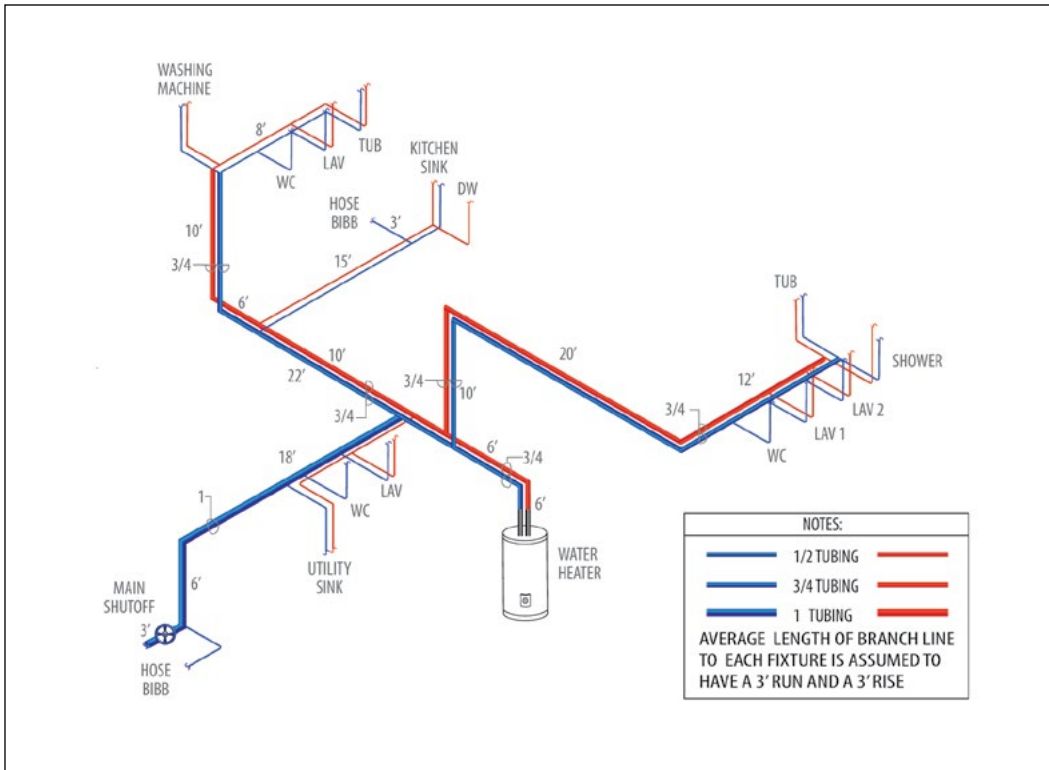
Trunk and Branch Isometric Riser for the Colonial House
